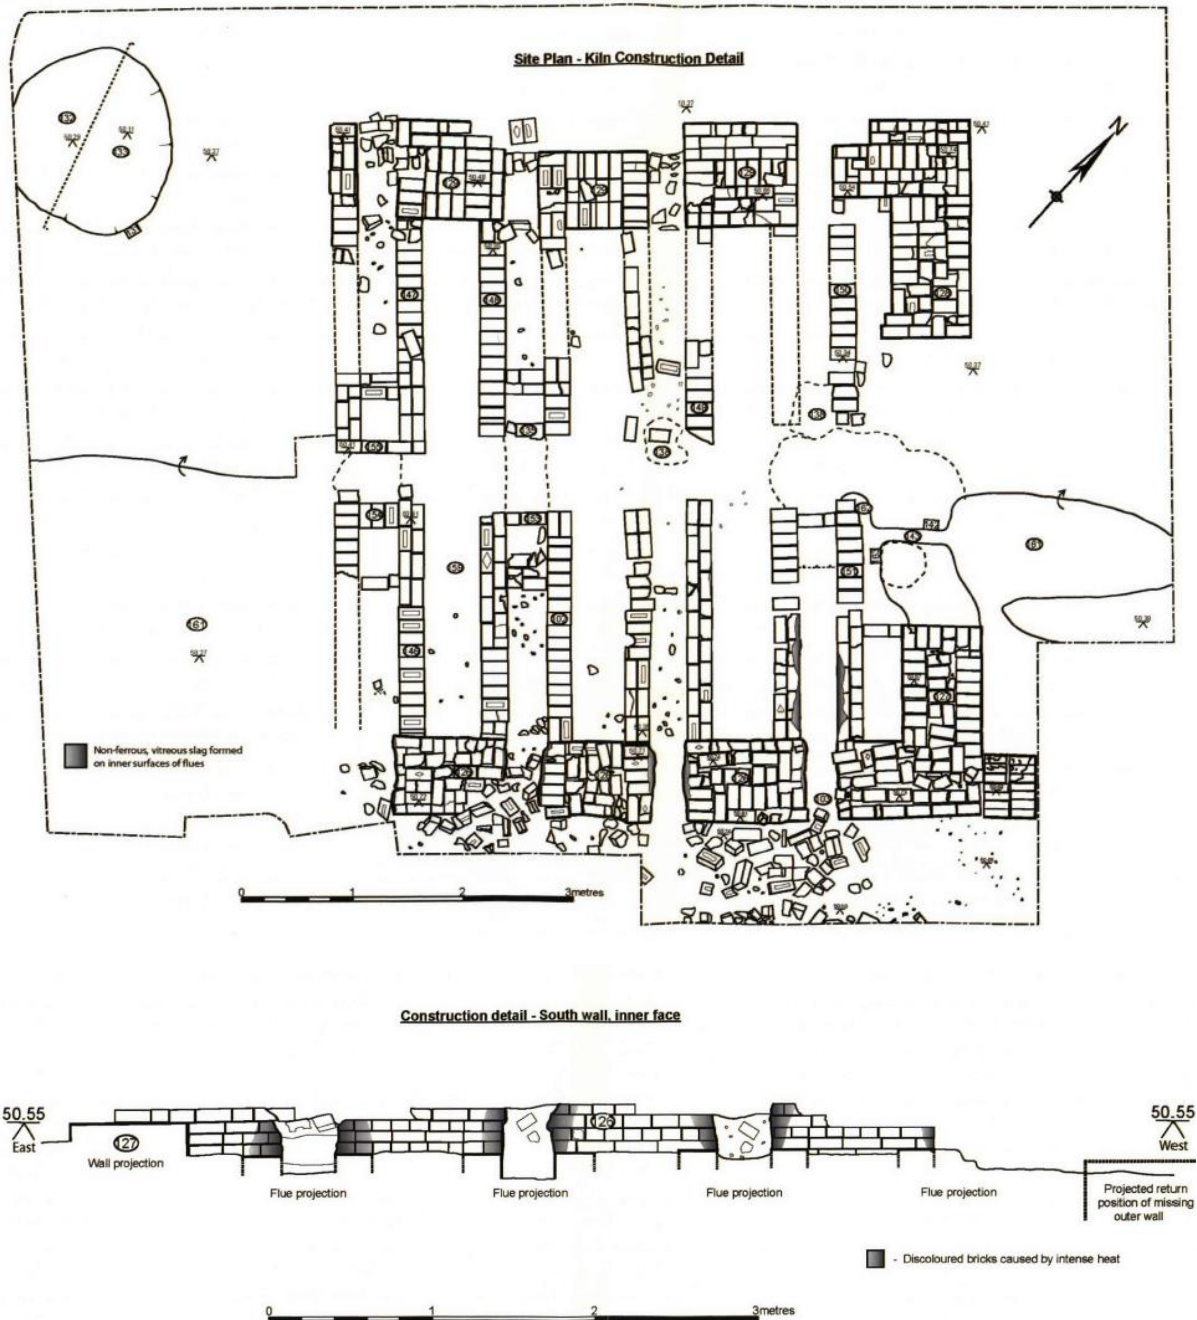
Plan of the brick kiln structure and section of the flue projections identified at Bridgman Ridge Estate. (Source: AMAC 2011, p 44-45)
